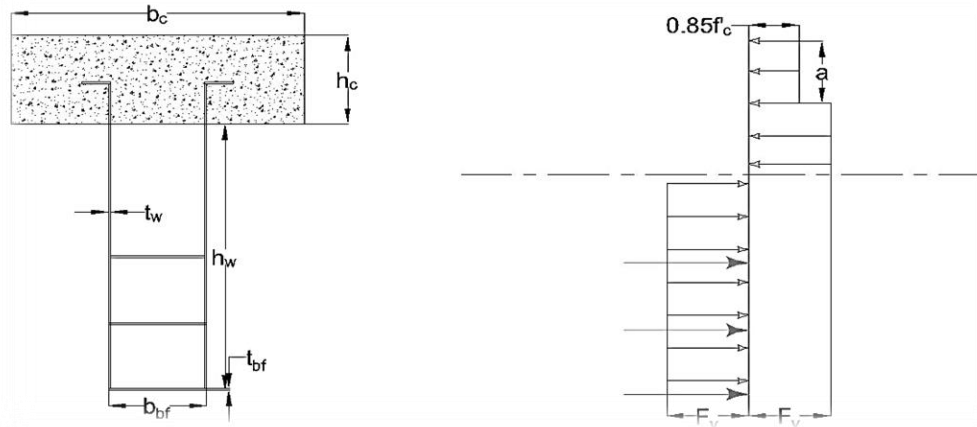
10 Composite section of multi flanged U steel section with Two intermediate flange
